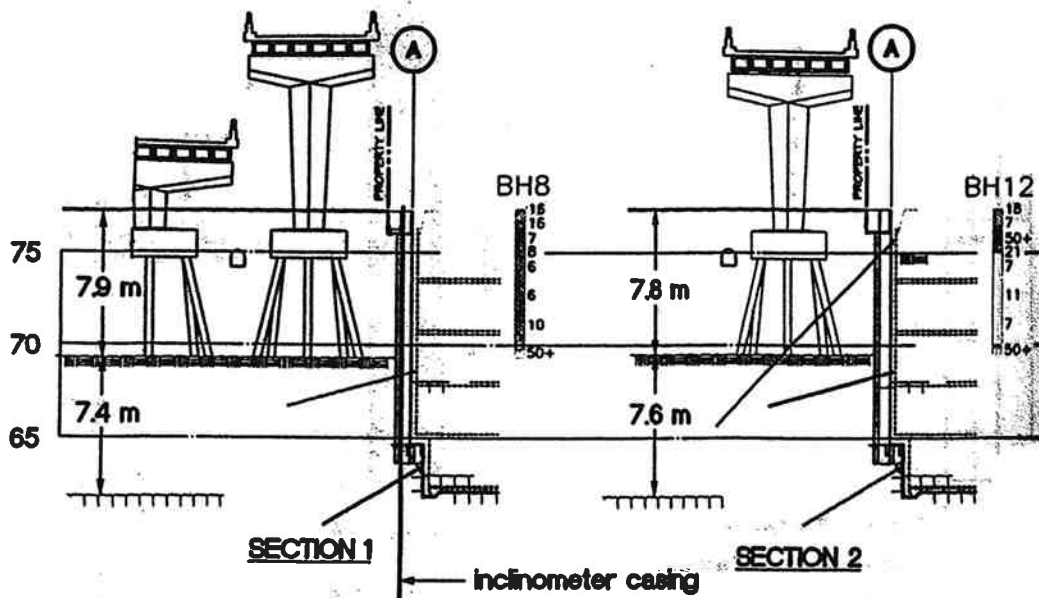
Sections showing five basement excavation at the Gardiner Expressway.
